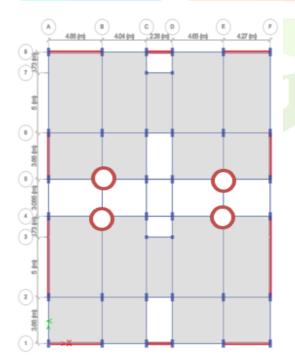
Plan view G+12 storey alternative single Shear walls single Shear walls
